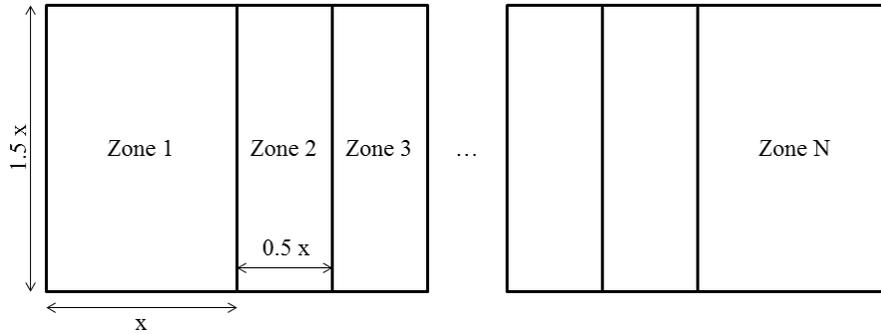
Retail strip mall zonal floor plan with N zones depending upon scaling factor
